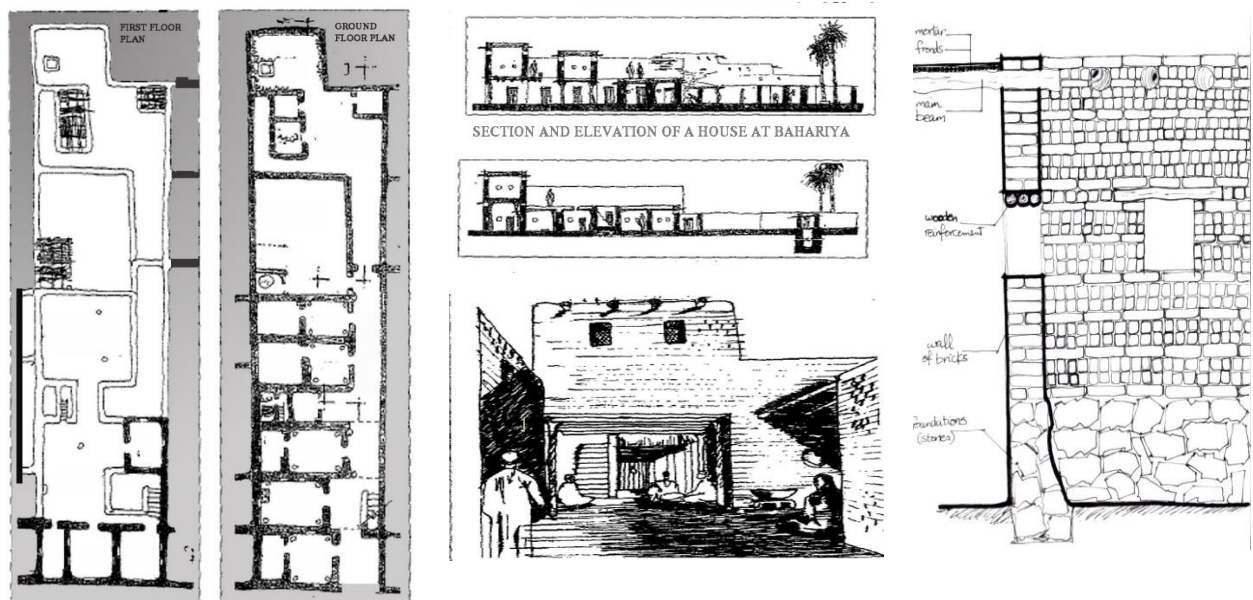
Typical plan, section of a Bahariya house (Alam El Banaa) and a wall section (Oasi Di Bahareya-Archeourb)
